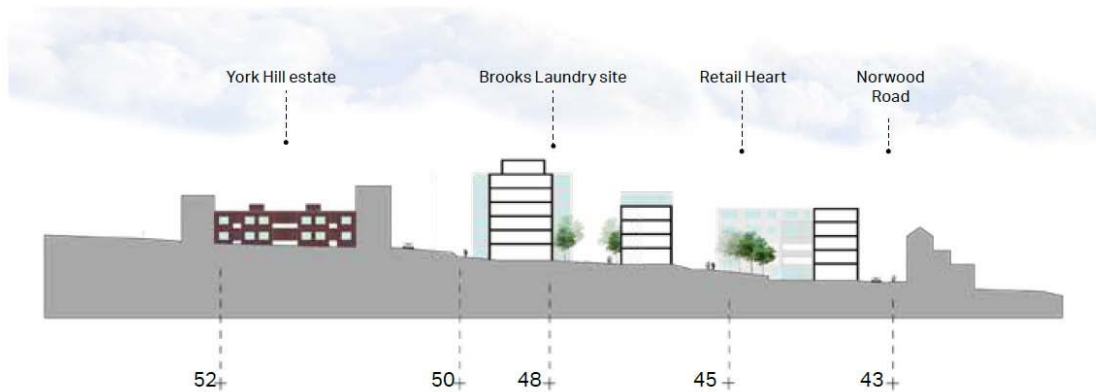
Retail Heart: Option 3C, looking west from Norwood Road
